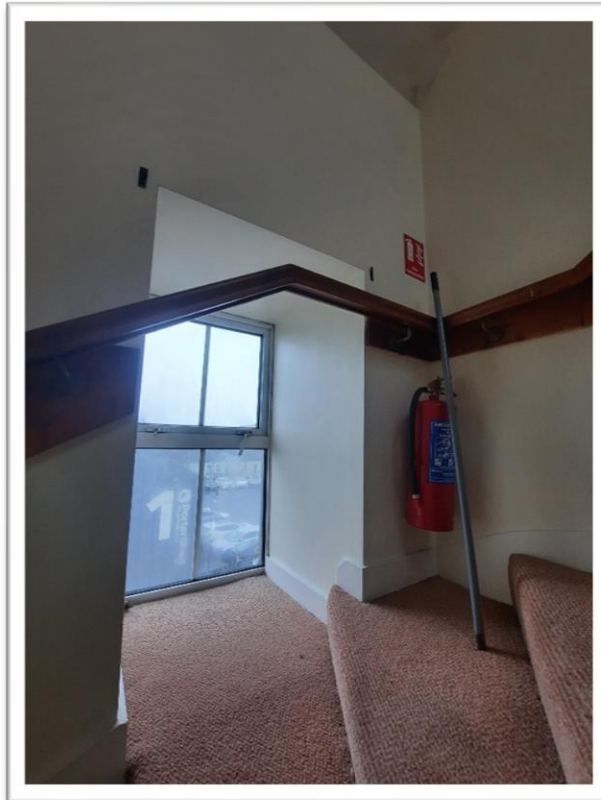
Open area at window along stairwell under the handrail. Tapered Steps to stairs
